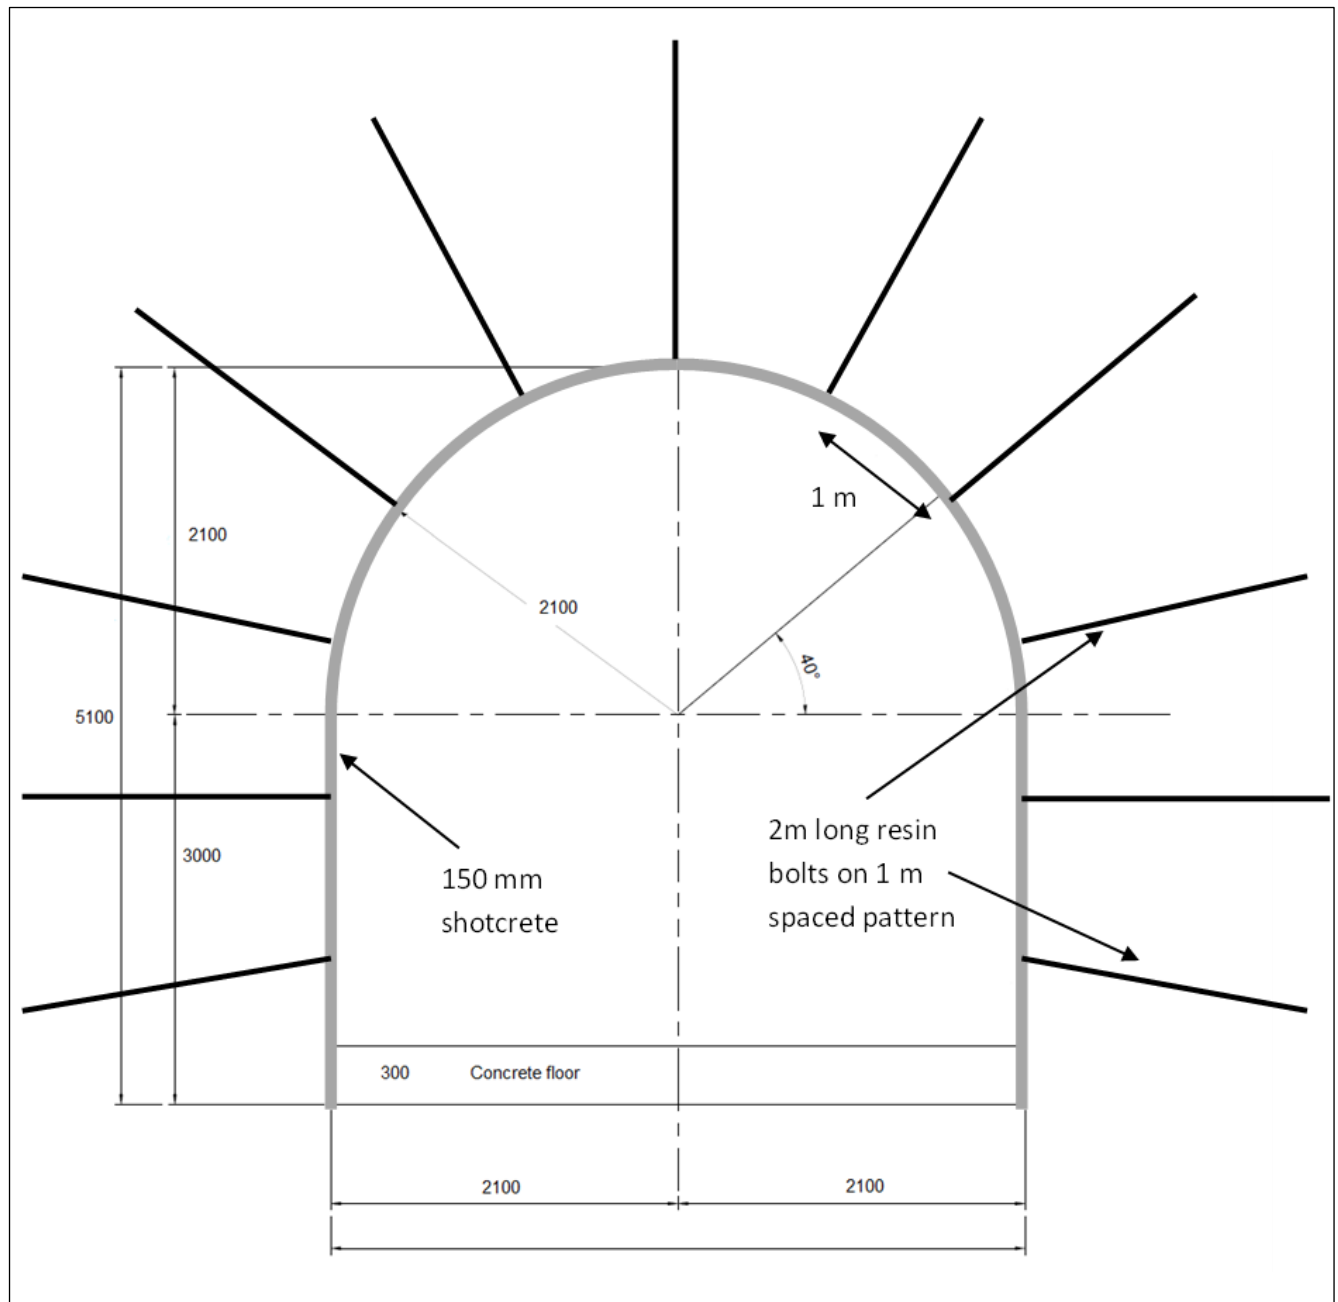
Trucking Decline Portal – Cross Section-Beyond 50m
